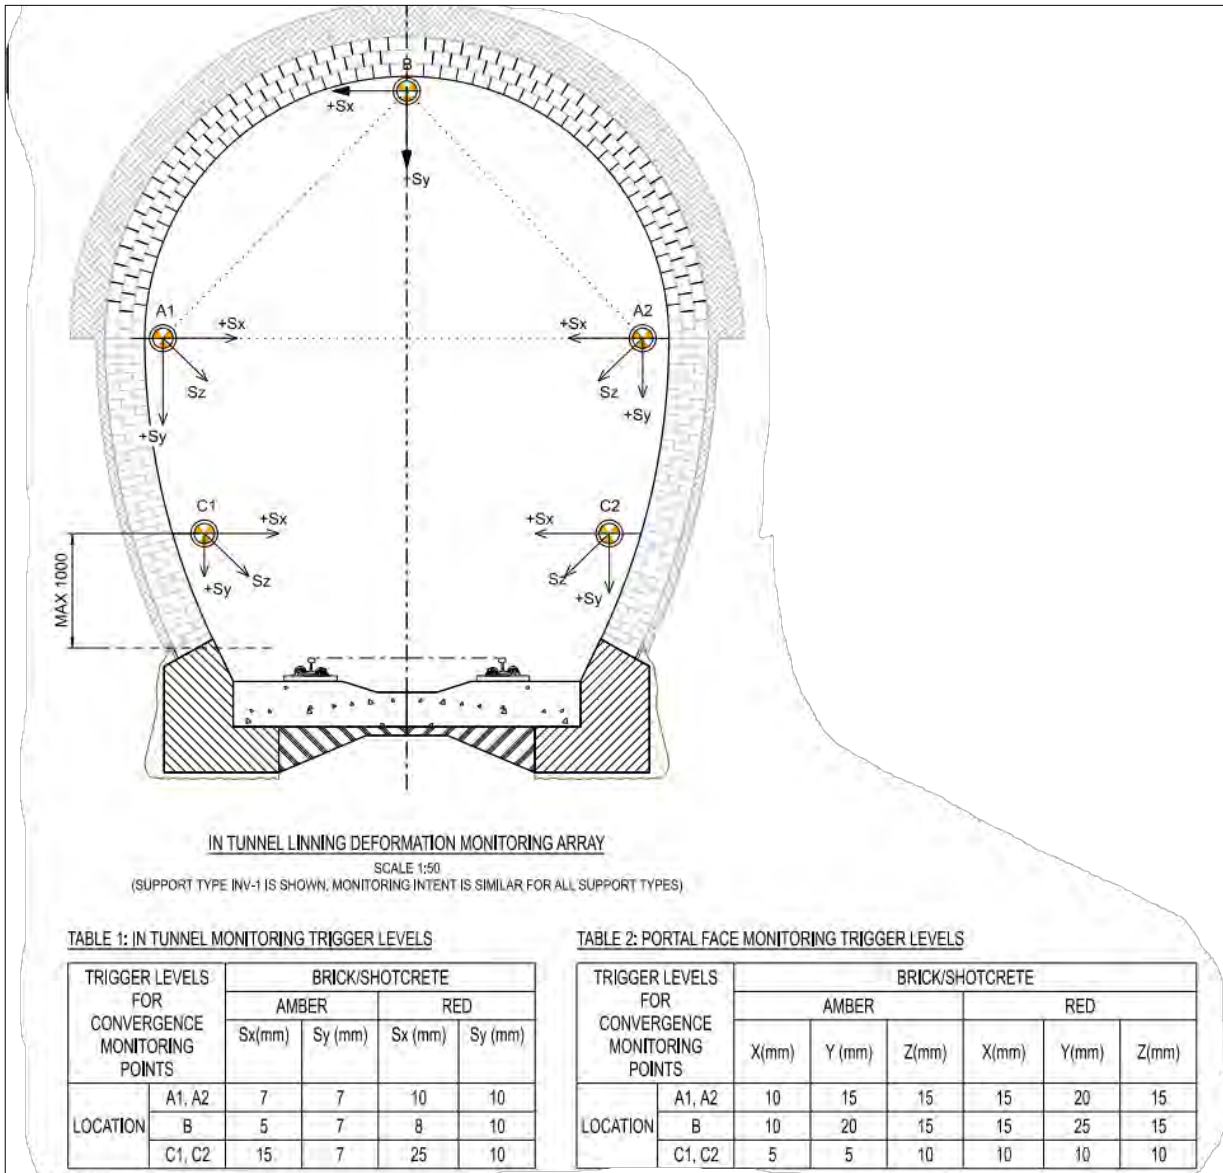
DRAWING SHOWING PROPOSED INSTRUMENT MONITORING INSIDE TUNNEL. (SOURCE: AURECON/VLINE)
